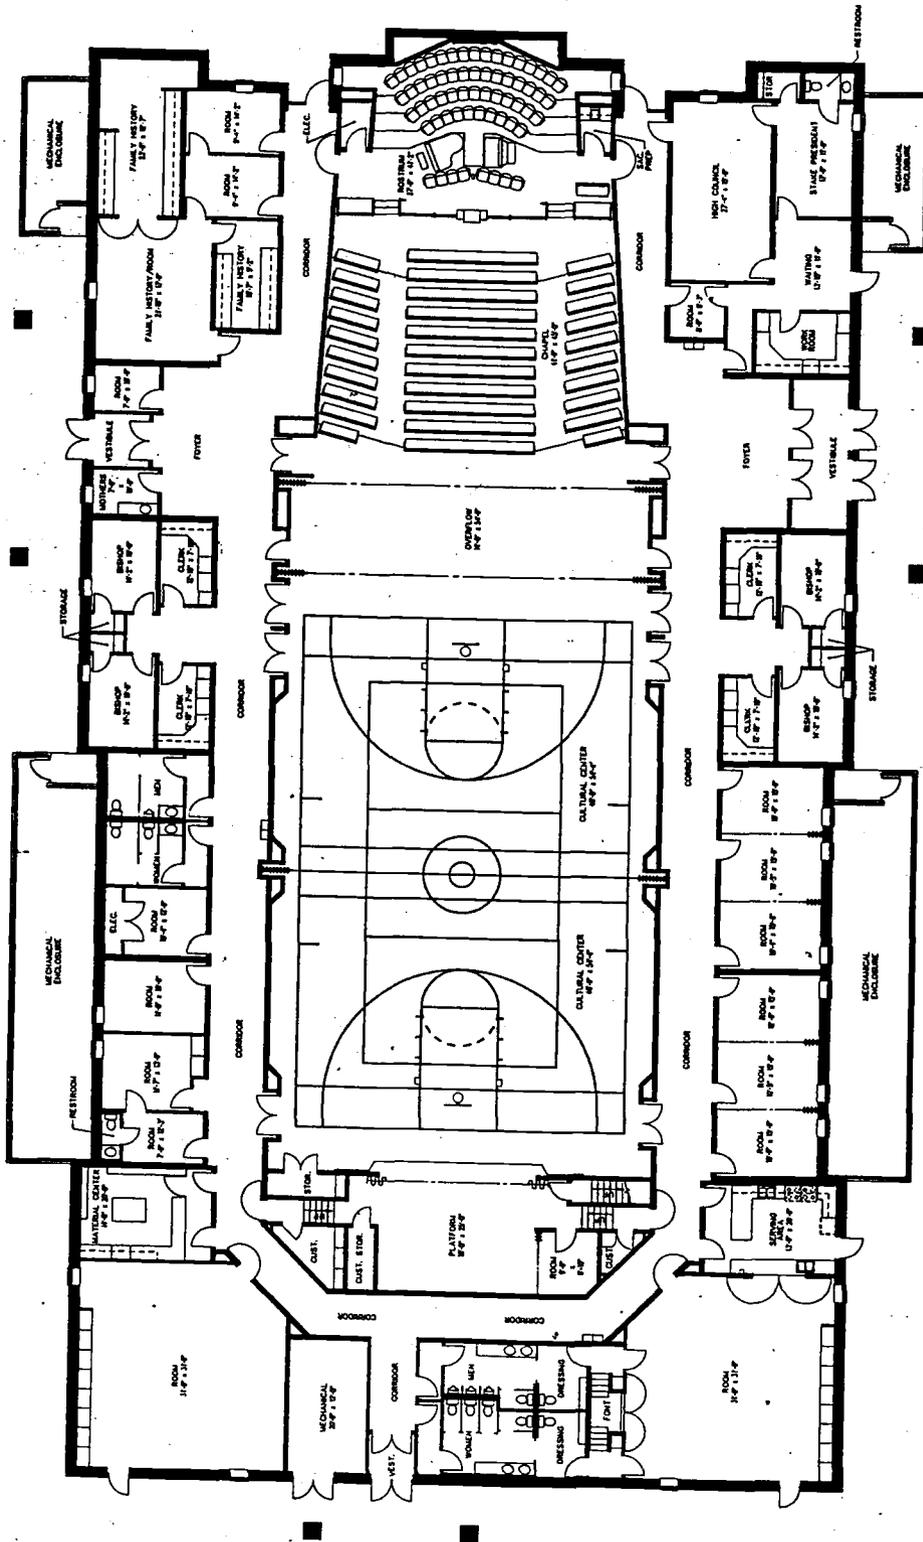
Stake center with a rectangular plan. LDS Church Architectural Services Division.
